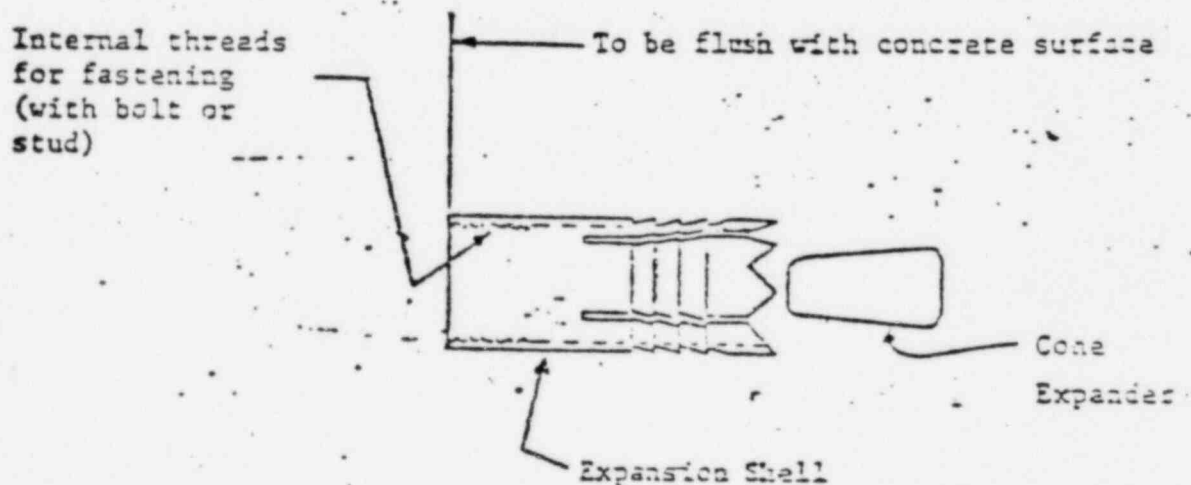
Typical Self-Drilling Type Expansion Anchor
